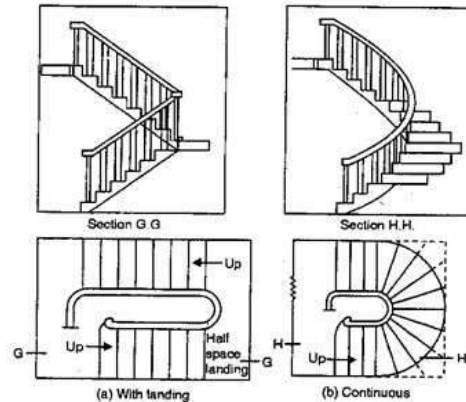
GEOMETRICAL HALF TURN STAIRS.
